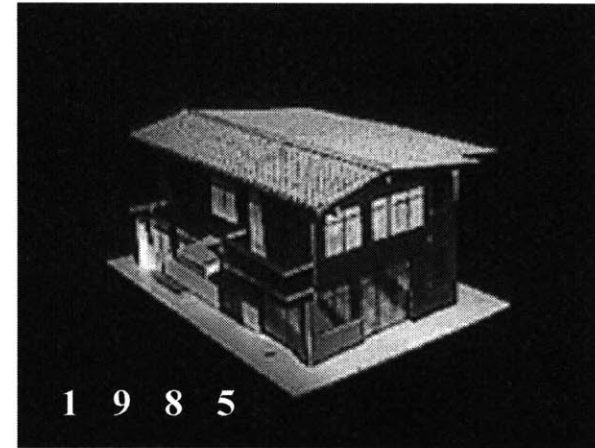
My house in 1985 with a laundry room added in the back..
